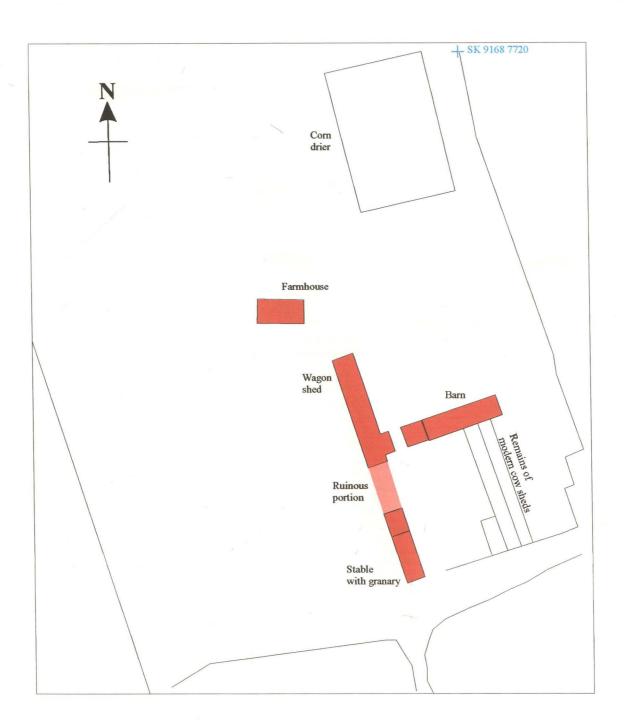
Plan showing principal buildings at Cornhills Farm. Those included in this survey are shown in red. 1:1,000
